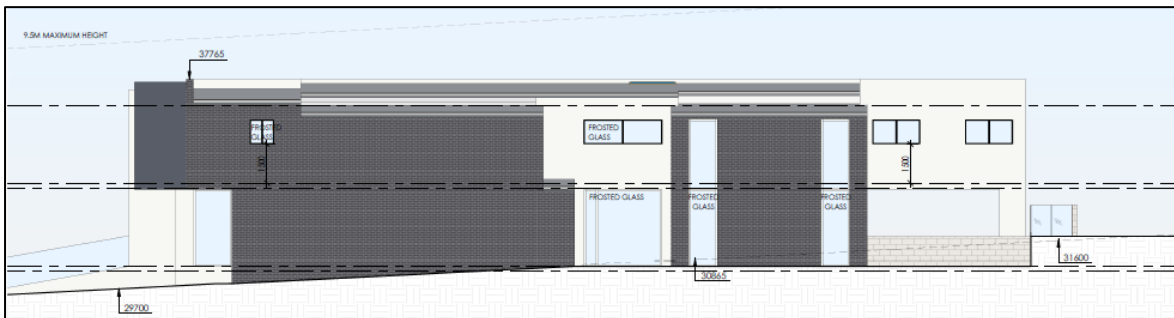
Approved Western Elevation (note: Condition 6 imposed to relocate Bedroom 1 to the void area and reduce the void around the stairs)
